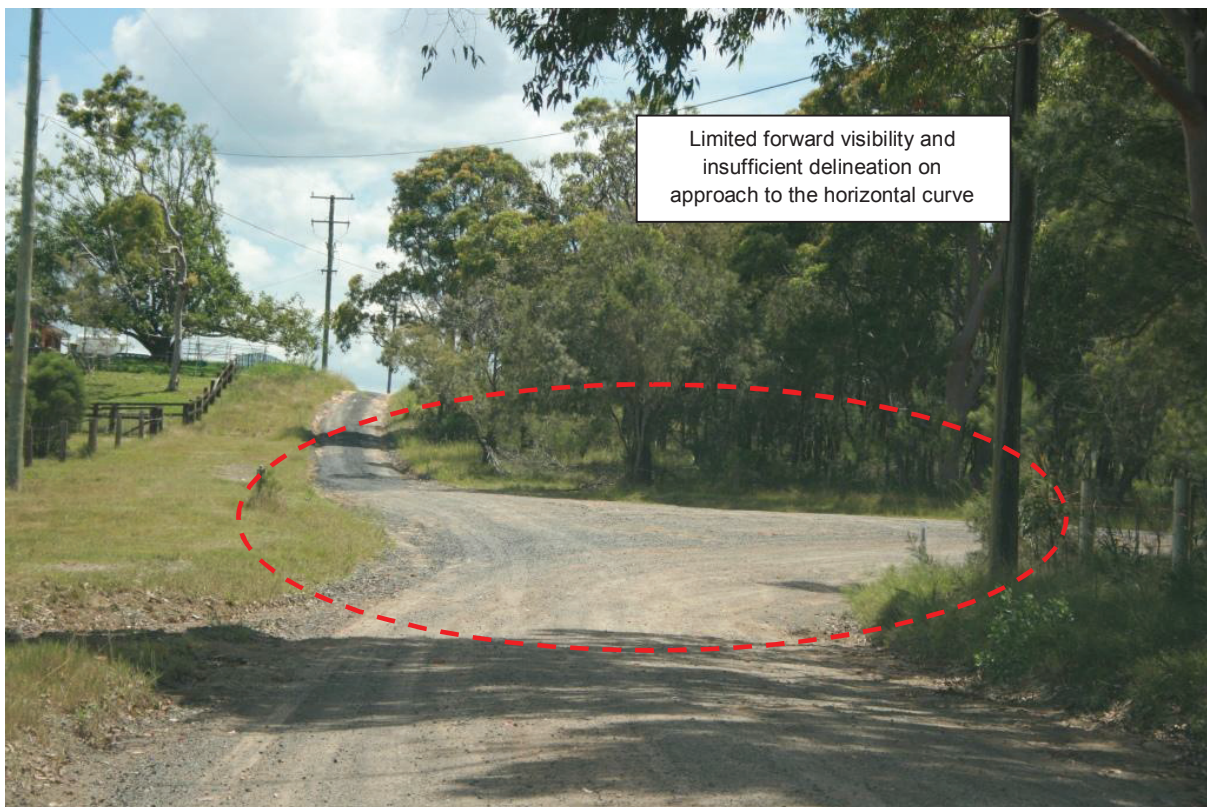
Tooheys Road, looking west toward a horizontal curve and a private access road
